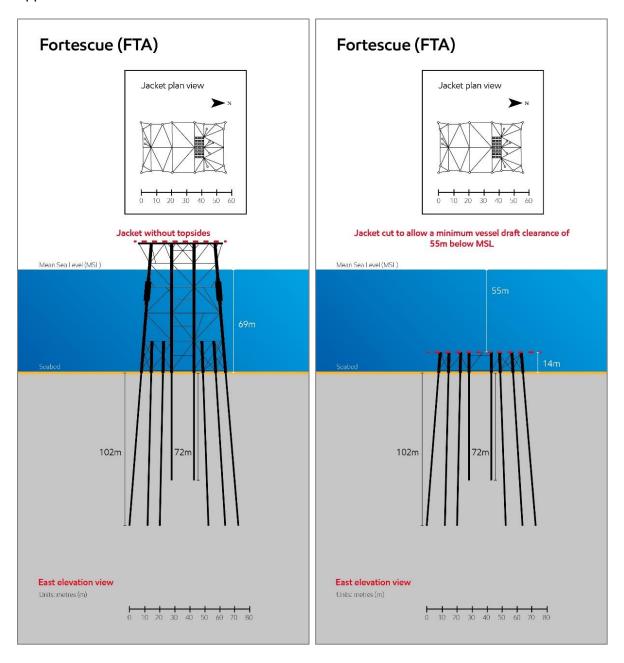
Fortescue Steel Piled Jacket without topsides (left) and under proposed end state (right)
